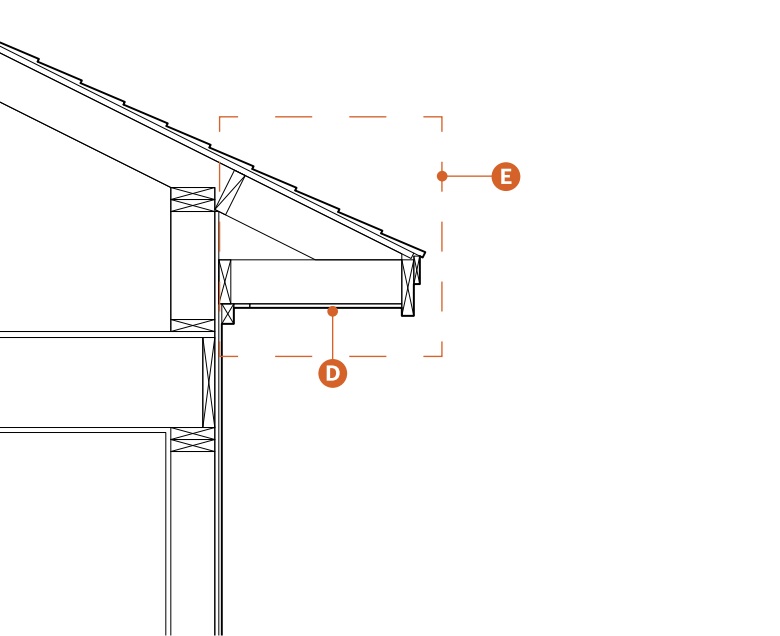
Section Detail of Highest Eave for Pitched Roof
